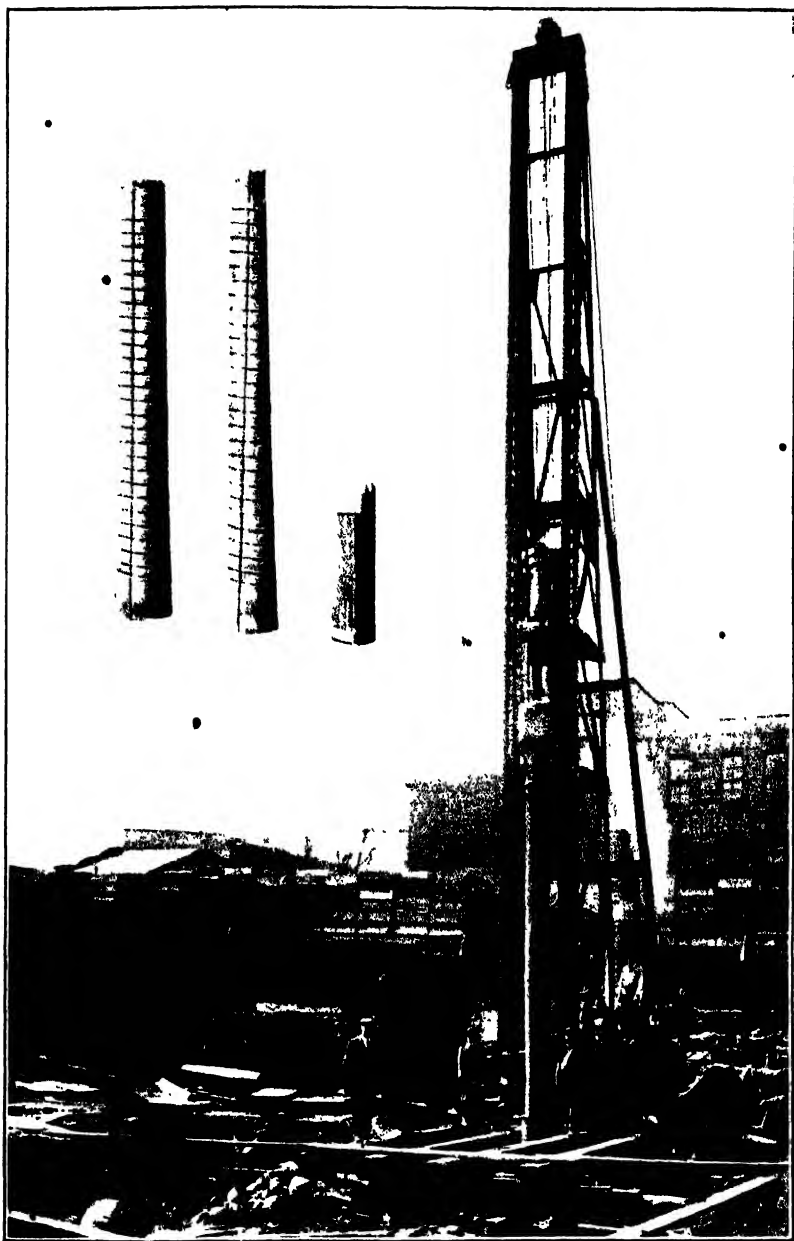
Two Sections of Reinforced Sheet-steel Shell and "Boot" Section.
